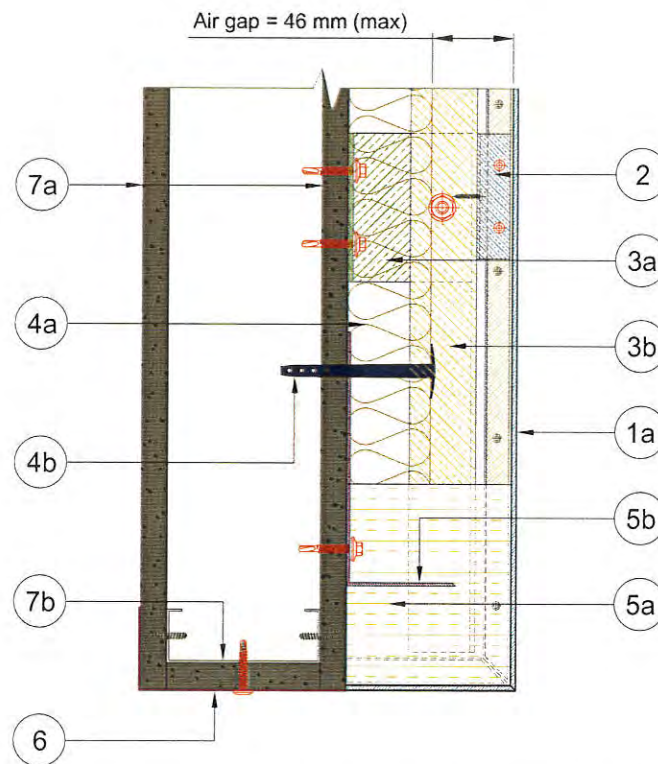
"Alstrong FR-B1" 4 mm thick Aluminium Composite Material Exterior Wall Cladding Assembly vertical window section details
